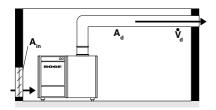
Extraction of air from a compressor room with a BOGE screw-type compressor, emitting the air into the open
